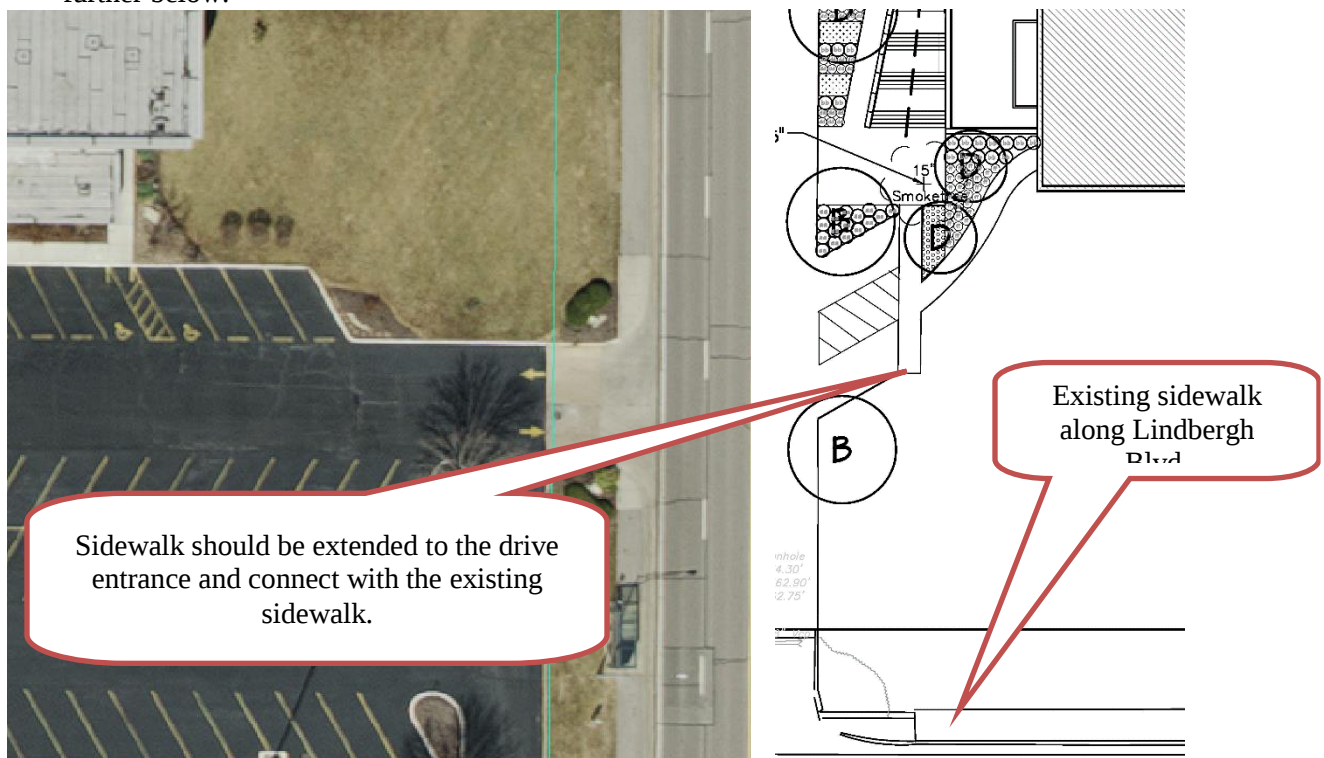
Close-up of existing site with the sidewalk along Lindbergh Blvd and the proposed site plan indicating new sidewalk at the entrance
